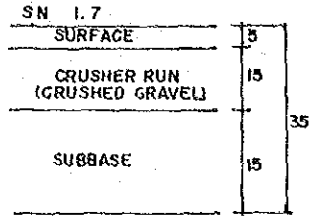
EXAMPLE OF CROSS SECTION DESIGN
